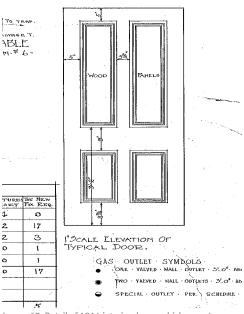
Detail of 1914 interior doors, which were 4- or 5-panel units throughout the building.
